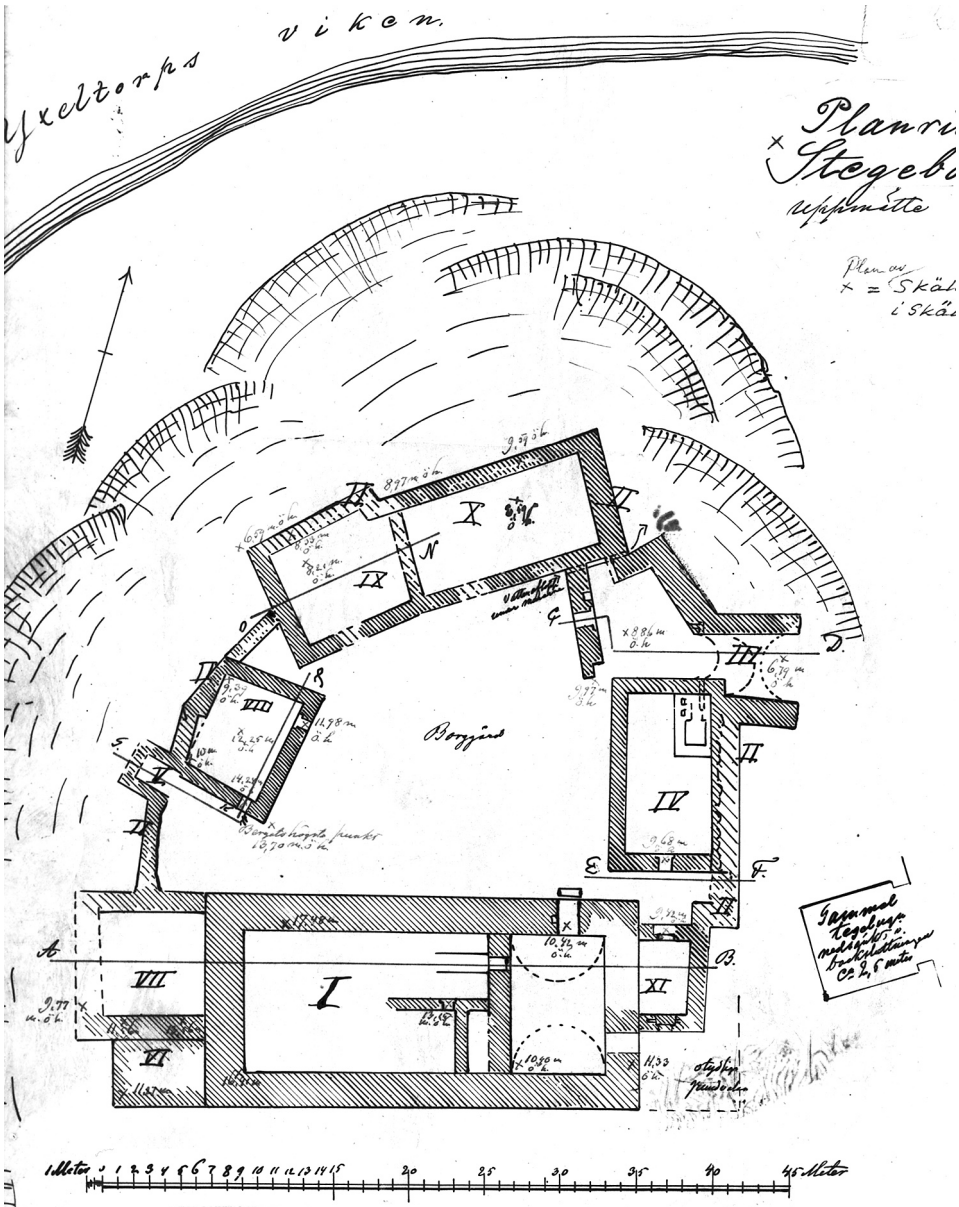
Architect Waldemar Lundberg's 1902 plan of Skällvik. ATA.
